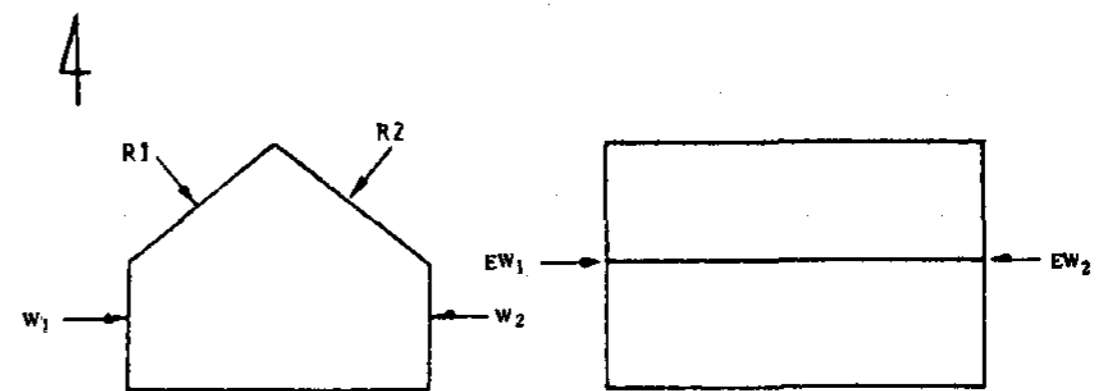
Schematic diagram for walls, end walls and roofs in the plastic greenhouse.
